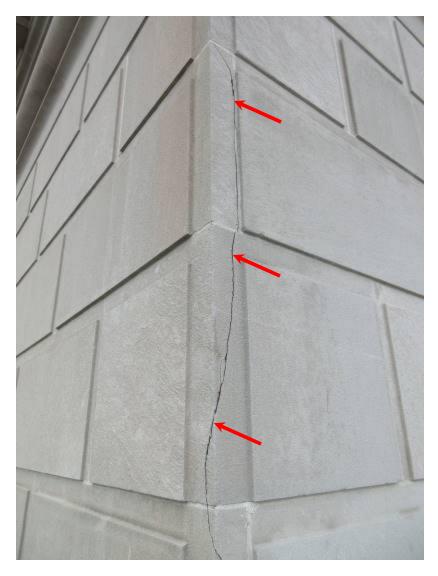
Cracked stones at the eighth floor at the northeast corner.
